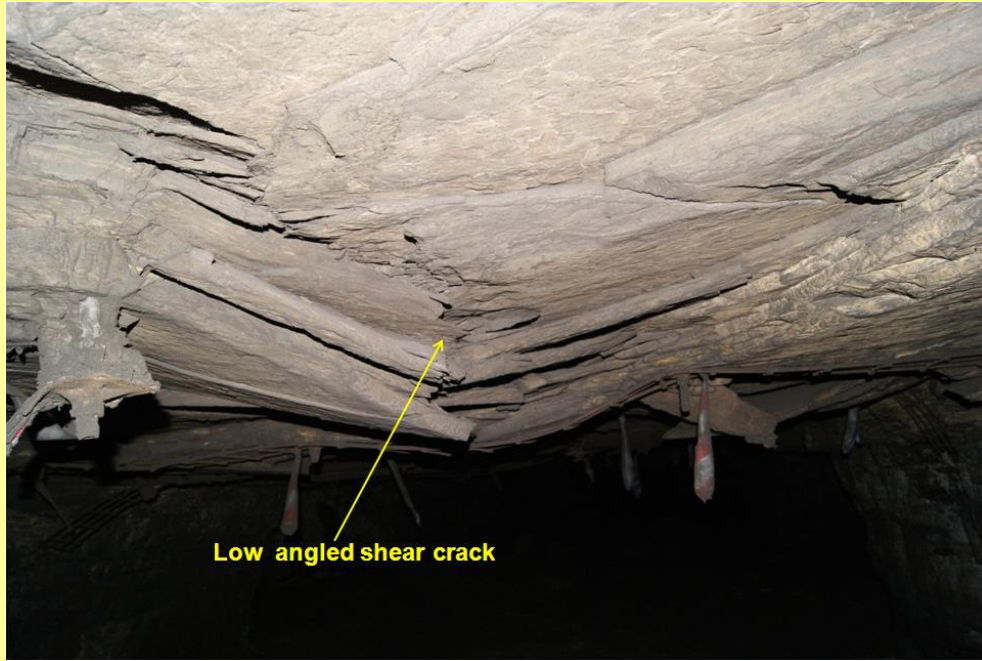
Picture showing a typical buckling of the mudstone roof and the low angled shear crack associated with it
